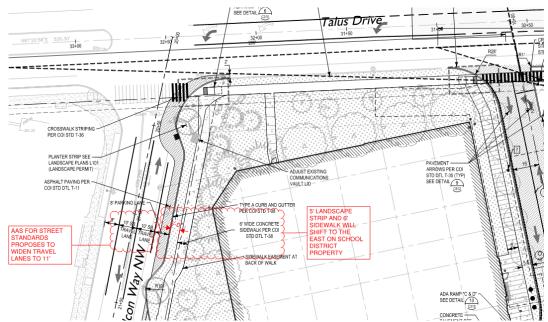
Excerpt from Sheet C601, Paving and Horizontal Control Plan – North, showing proposed modifications to Falcon Way NW.
